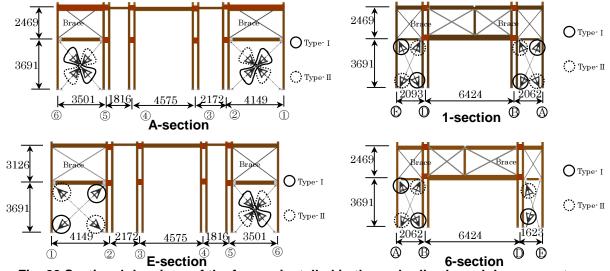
Sectional drawings of the frames installed in the umbrella shaped damper systems
